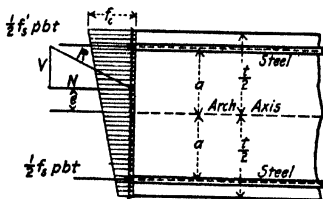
Stresses caused by a force producing compression upon the whole reinforced section.
